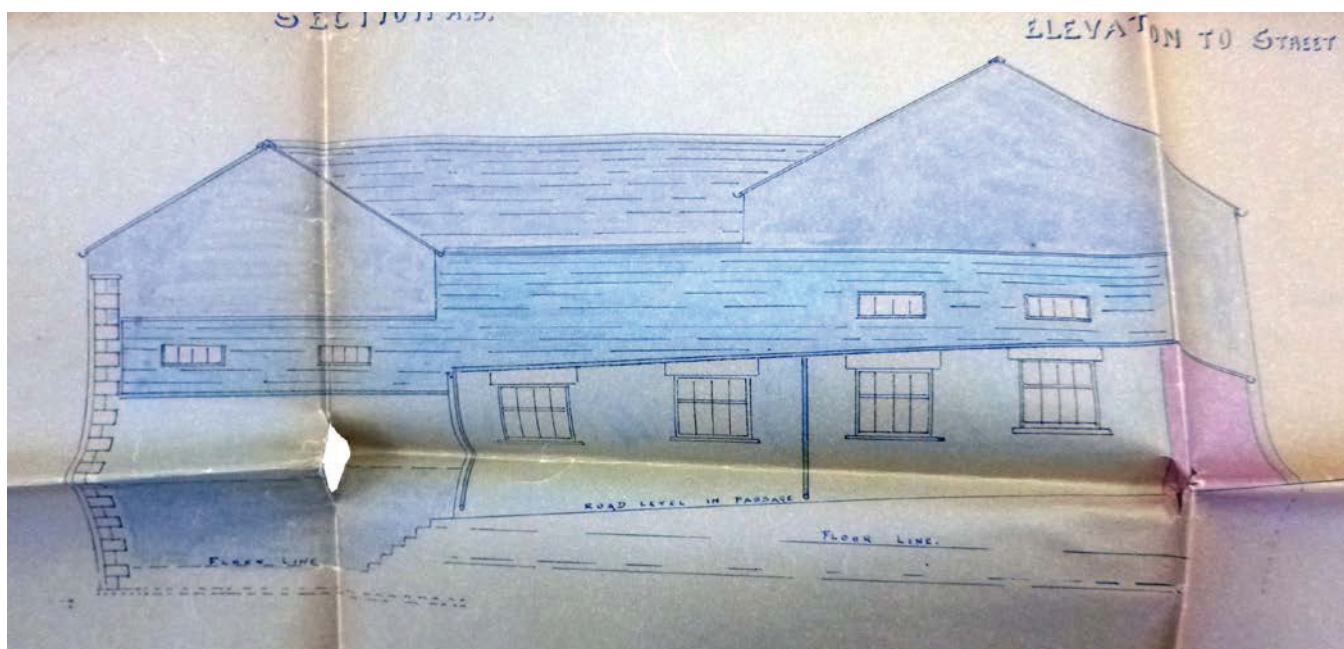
North-west elevation for proposed addition to the Old Brewery, 1912
